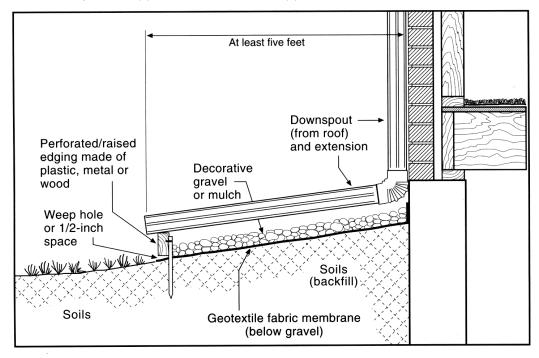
Properly designed runoff slope next to a house foundation. Note that roof drainage is carried by a downspout extension to a point beyond the slope. (From Holtz and Hart, 1978.)
